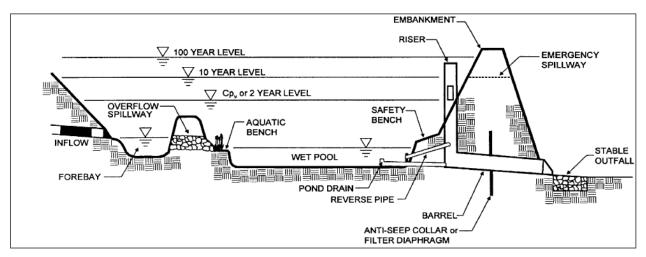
Typical Profile of Wet Pond (MDE 2000 Stormwater Design Manual)
